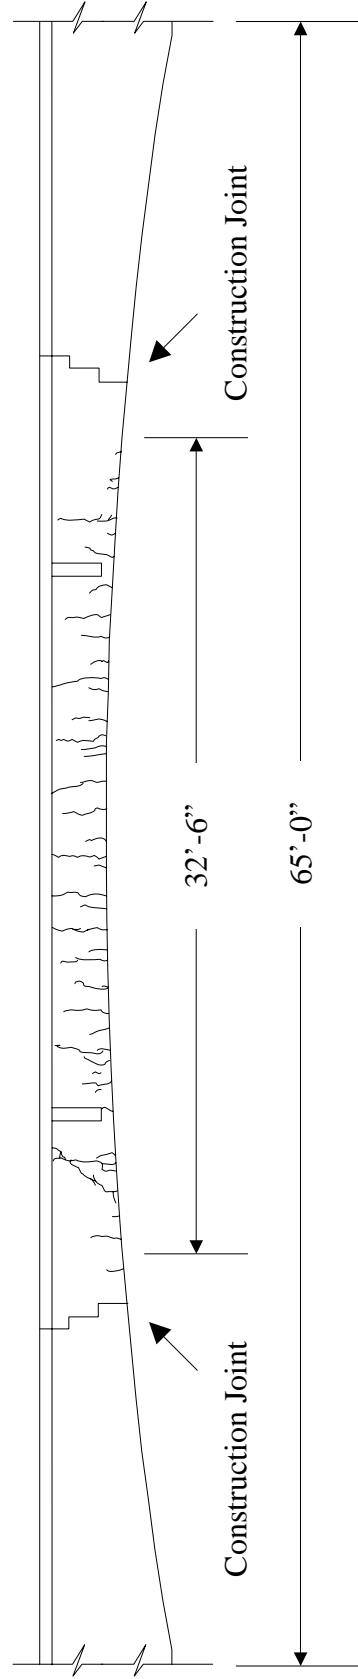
Crack Pattern for Typical Center Girder
